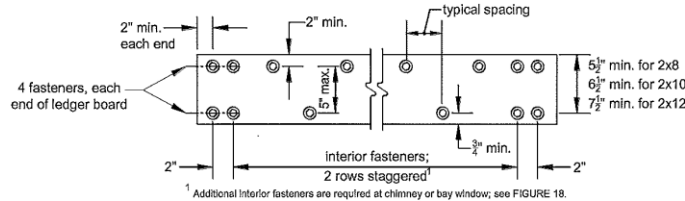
LEDGER BOARD FASTENER SPACING AND CLEARANCES
